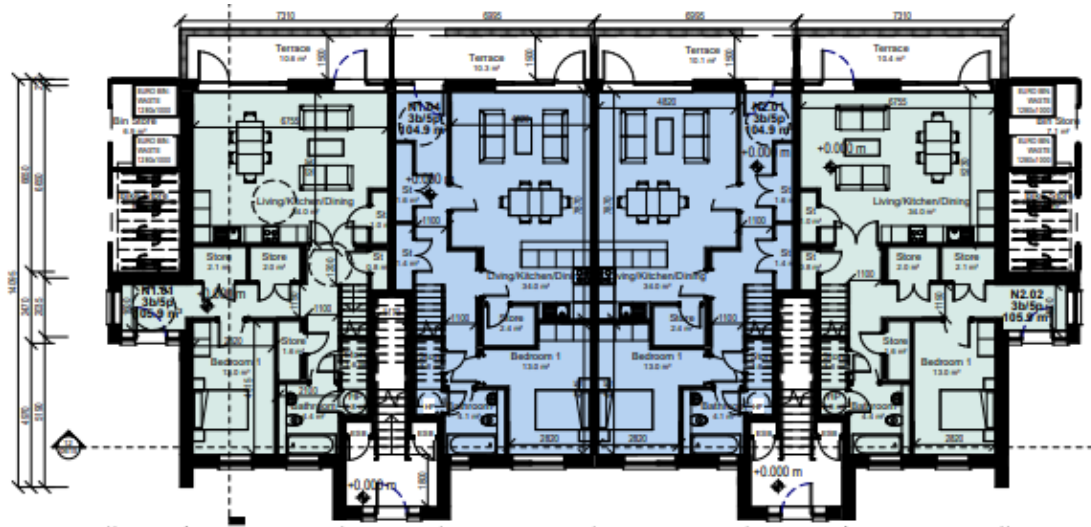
Proposed ground floor plan of Duplex Block Type N
